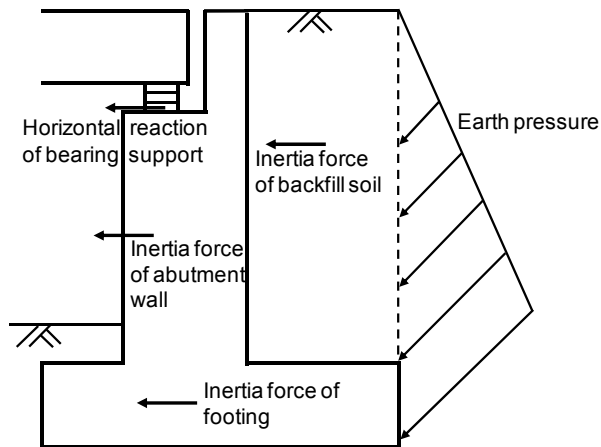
Loading state assumed in verification of abutment foundation (Vertical forces except earth pressure are omitted for simplicity)
